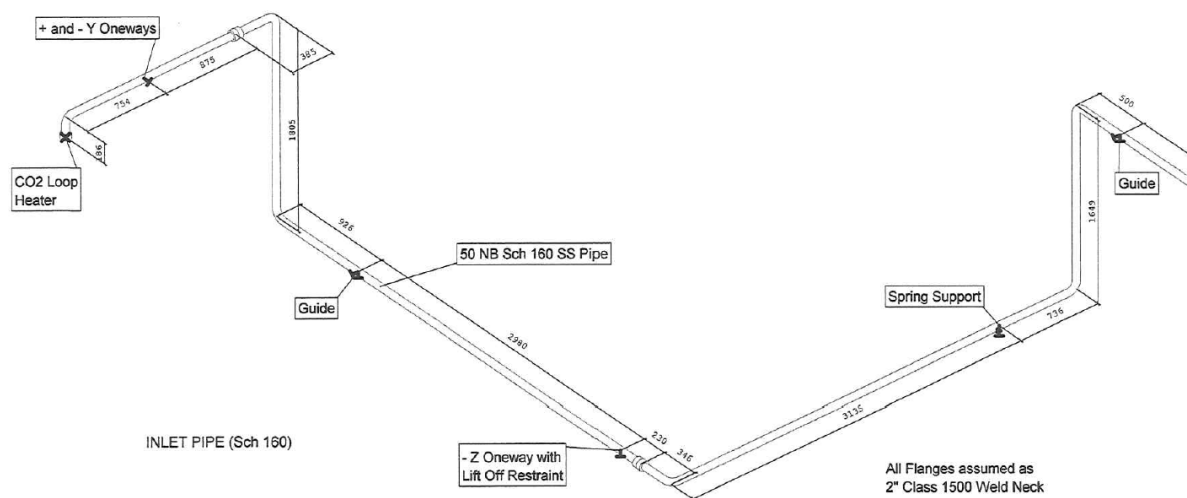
Layout of fixings for the pipes connecting the recuperator outlet to the heater inlet
